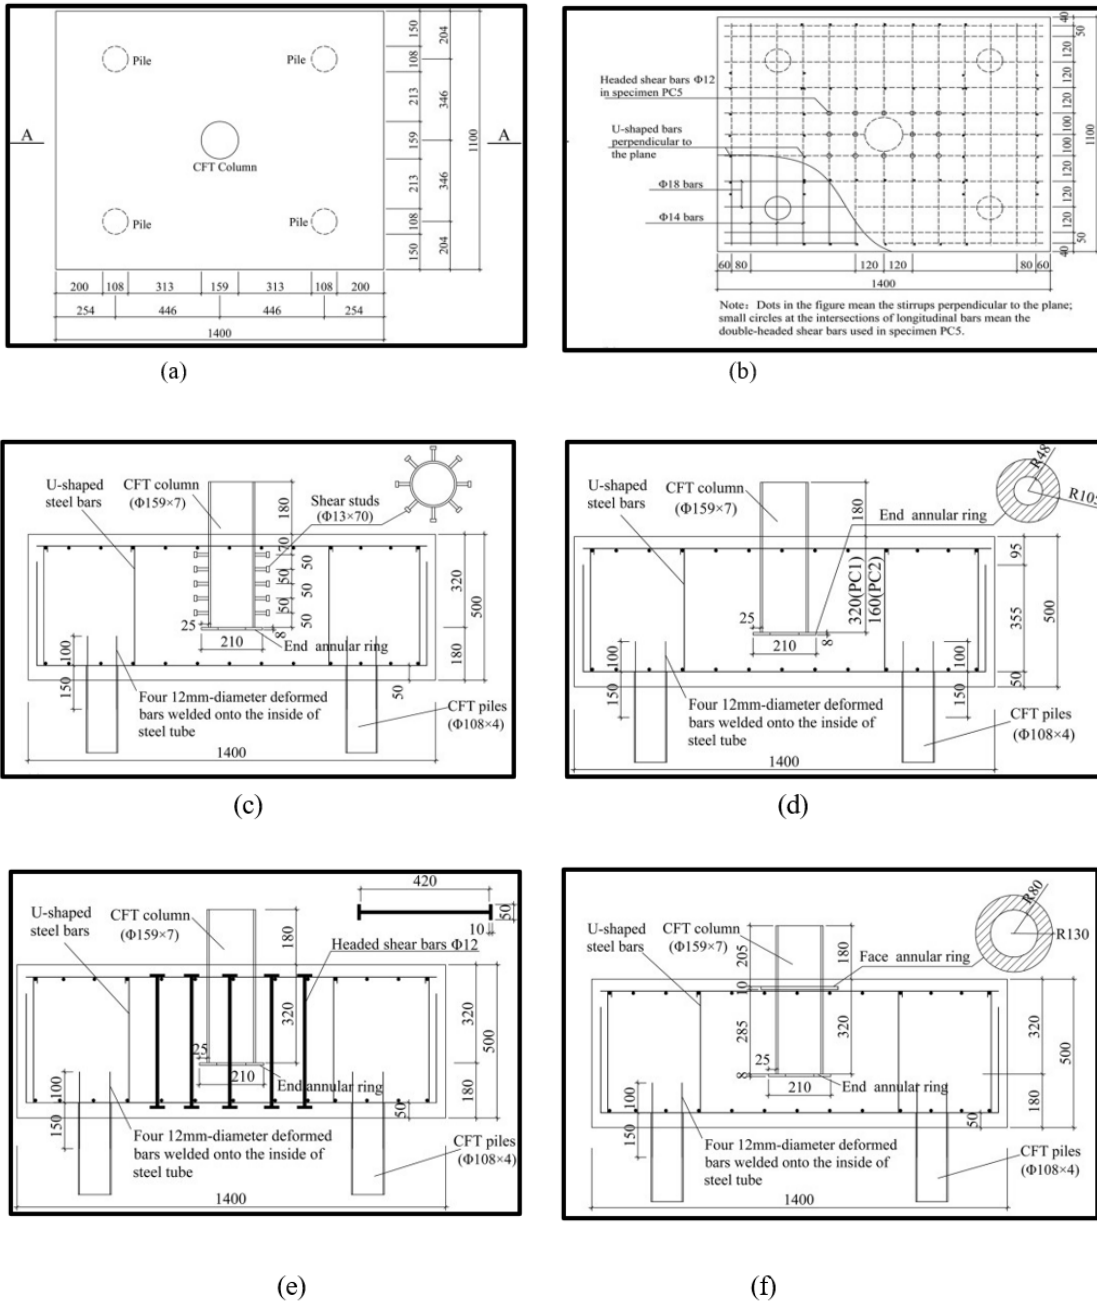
Details of specimens PC1-PC5(mm); (a) dimensions of pile caps; (b) steel reinforcement of pile caps; (c) A-A section of specimens PC3; (d) A-A section of specimens PC1 and PC2 with different embedment depths of column; (e) A-A section of specimen PC5; (f) A-A section of specimen PC4 [15]
